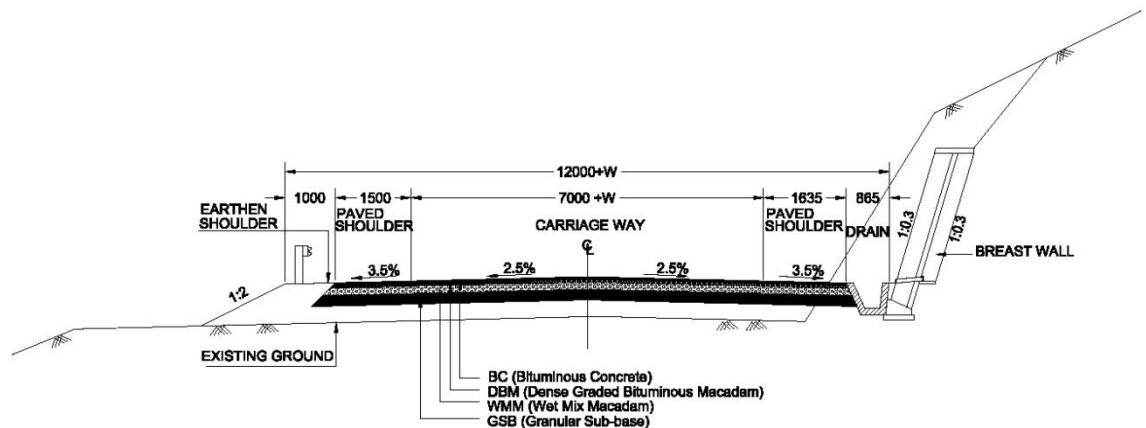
(1): Typical Cross Section for Widening Primarily to Hill Side
